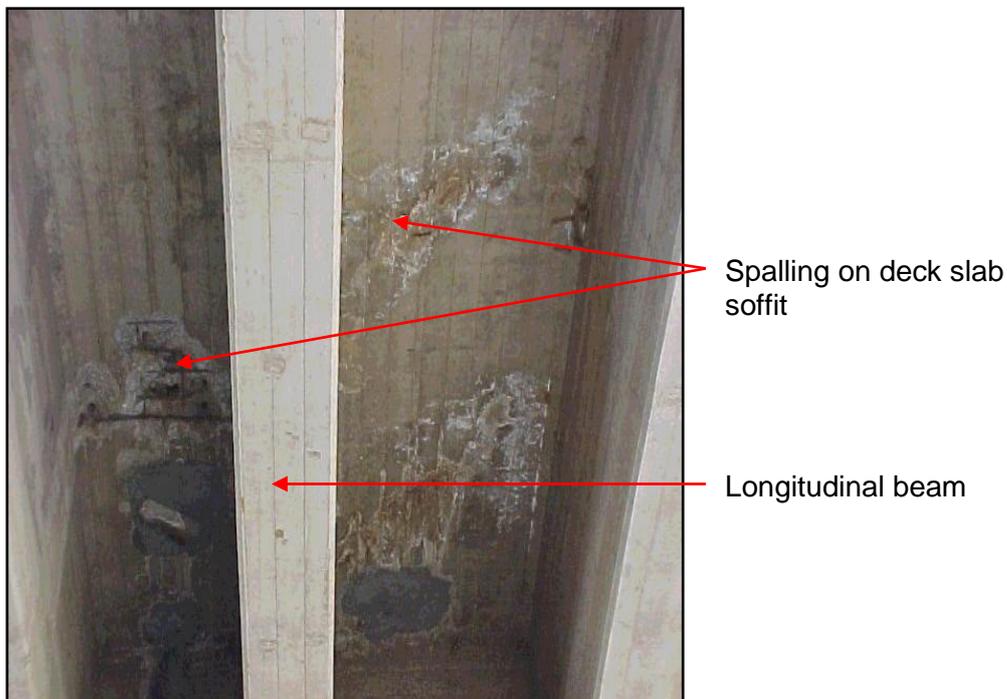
Carbonation induced corrosion of a bridge deck soffit in Gauteng (Source, Author)
